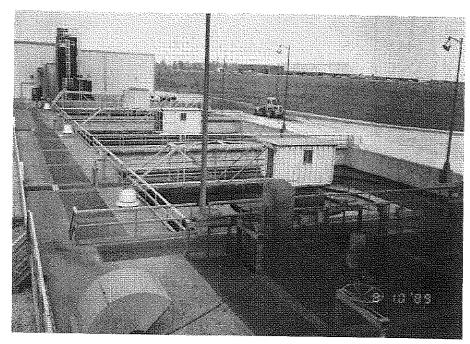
West view of the Cement Dust Bins, Sludge Filter System (SWMU 34) conveyor, Sludge Bin (SWMU 35), and Sludge Roll-Off/Hauler (SWMU 36). Note sludge on pavement.
